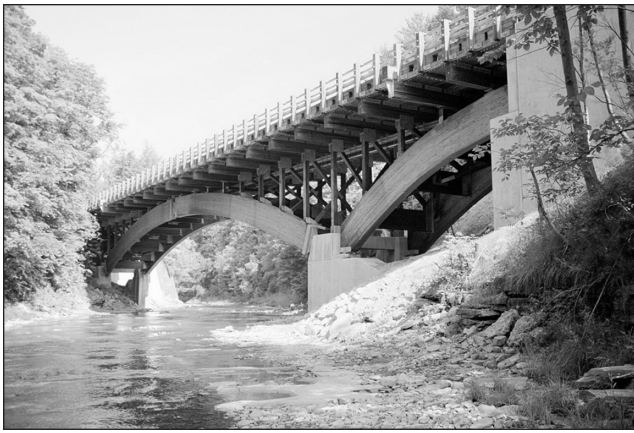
The Alton Saylor Memorial Bridge is a glulam deck arch bridge crossing Jonyce Gorge in Angelica, New York. The center three-hinged arch spans 52 m (171 ft) and is the longest clear span in the United States. (Photo courtesy of Laminated Concepts, Inc., Big Flats, New York.)
